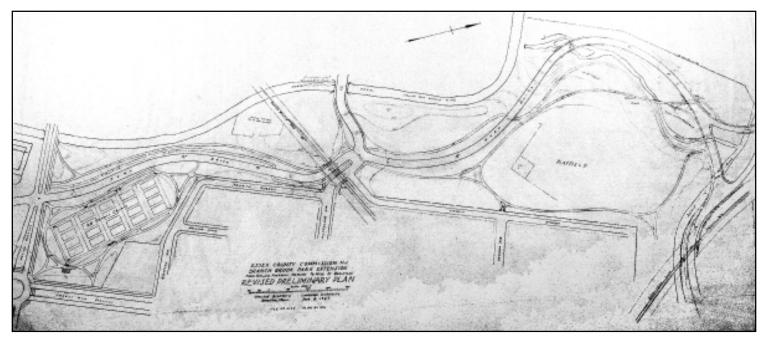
Revised Preliminary Plan from Heller Parkway to Mill Street, Belleville. Plan #2121-726, 8 June 1927. Source: ONHS.
